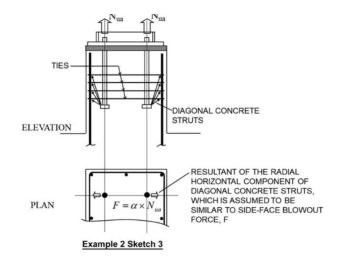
The use of steel reinforcement for restraining tension concrete breakout.
